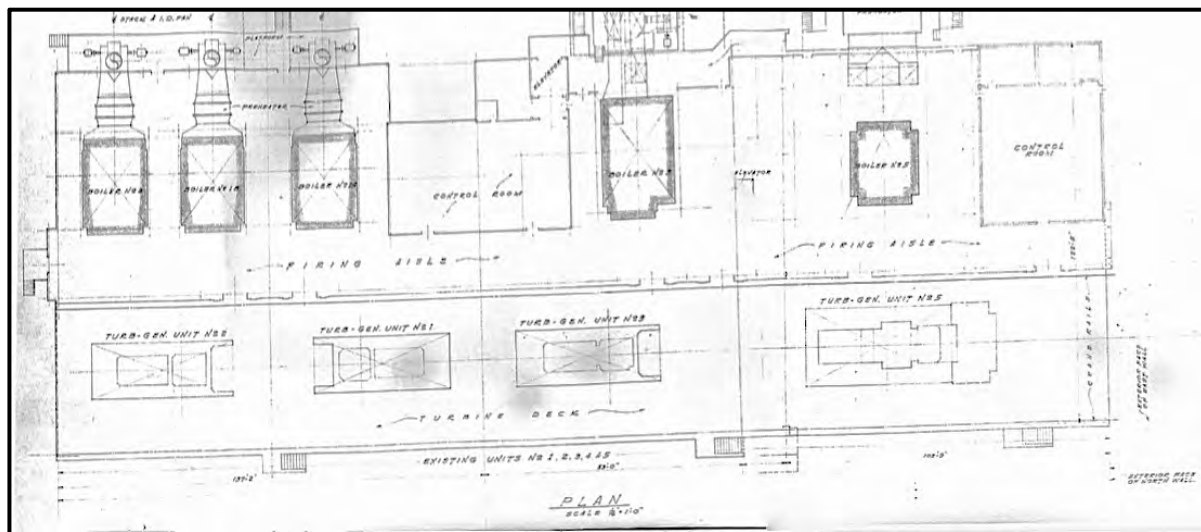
Architectural Floor Plan at the time of Unit 4 construction. Glendale's Steam Power Plant Drawn by Daniel Elliott (Collection of City of Glendale Water & Power)
